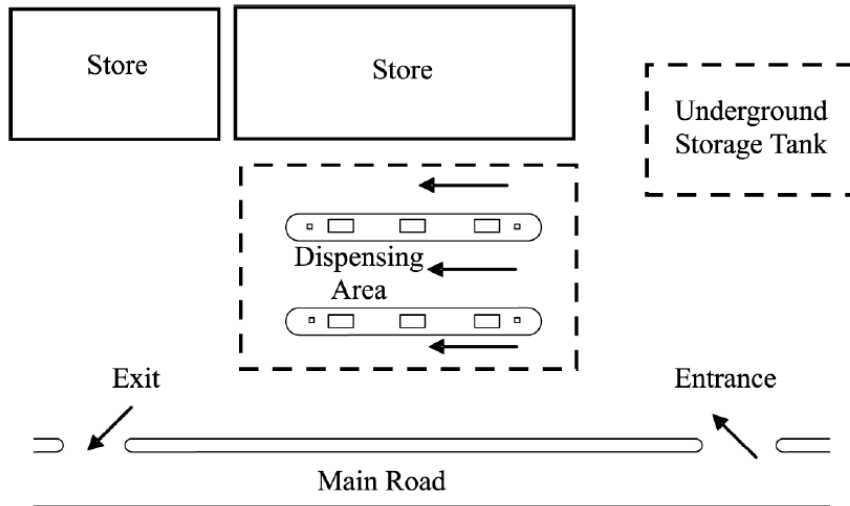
Typical Design Layout of Petrol Filling Station Facilities [2]
